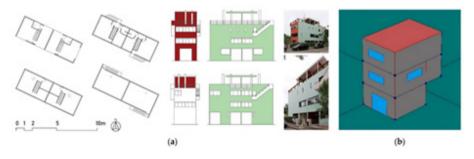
a) Plans, Sections, and Photos of the Garches Villa b) Computer Model
